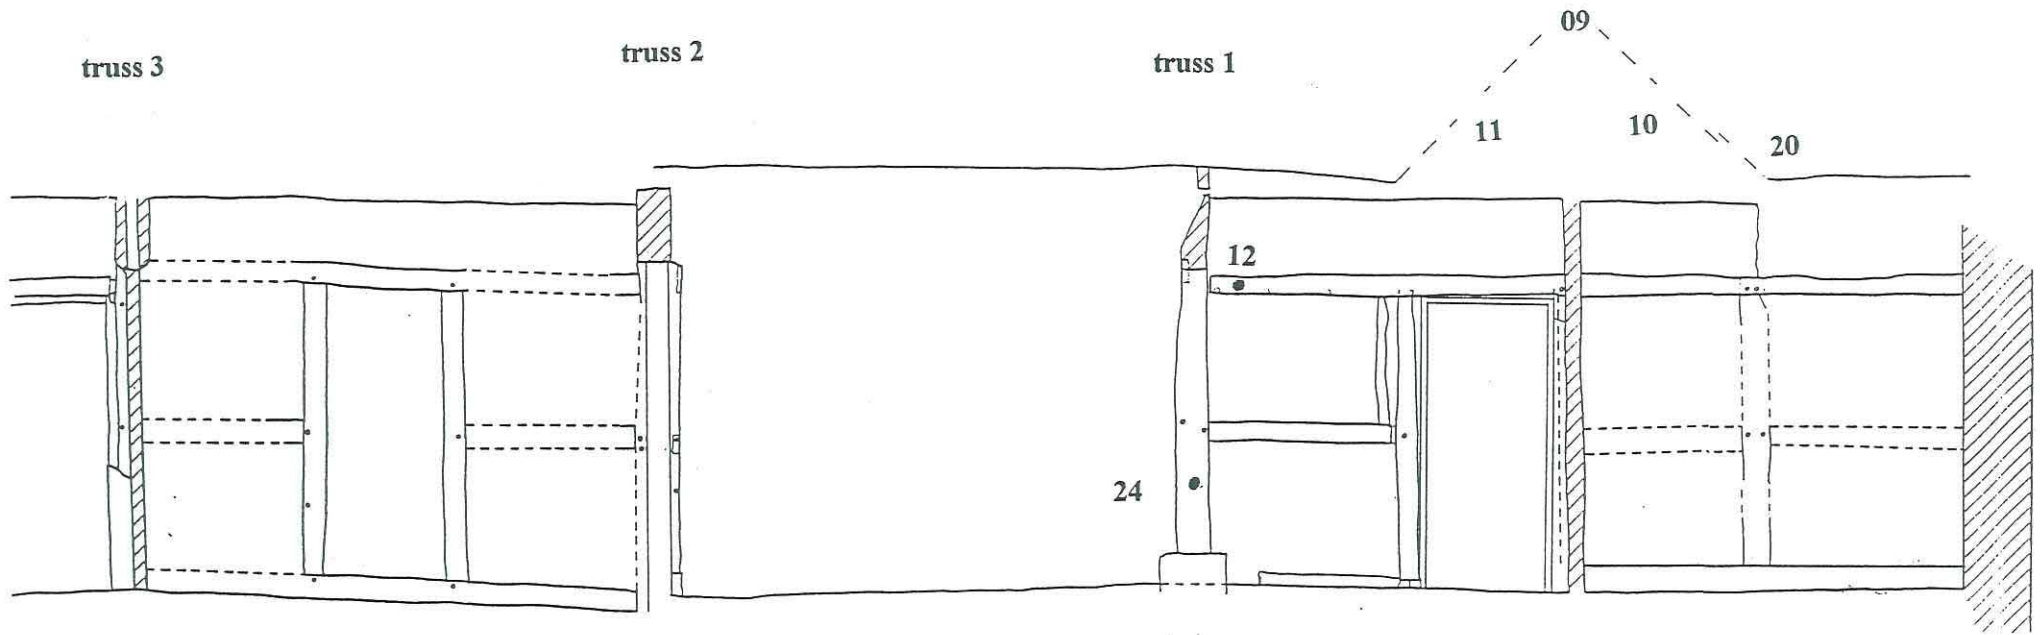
Elevation of the south wall of the roof space to show position of samples
